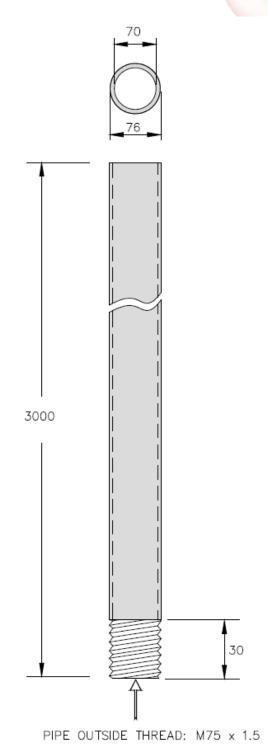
SERVICE DROP STEEL PIPES (70 mm INSIDE DIAMETER) WITH 3.0 mm MINIMUM THICKNESS, ±5% TOLERANCE (908202229)
